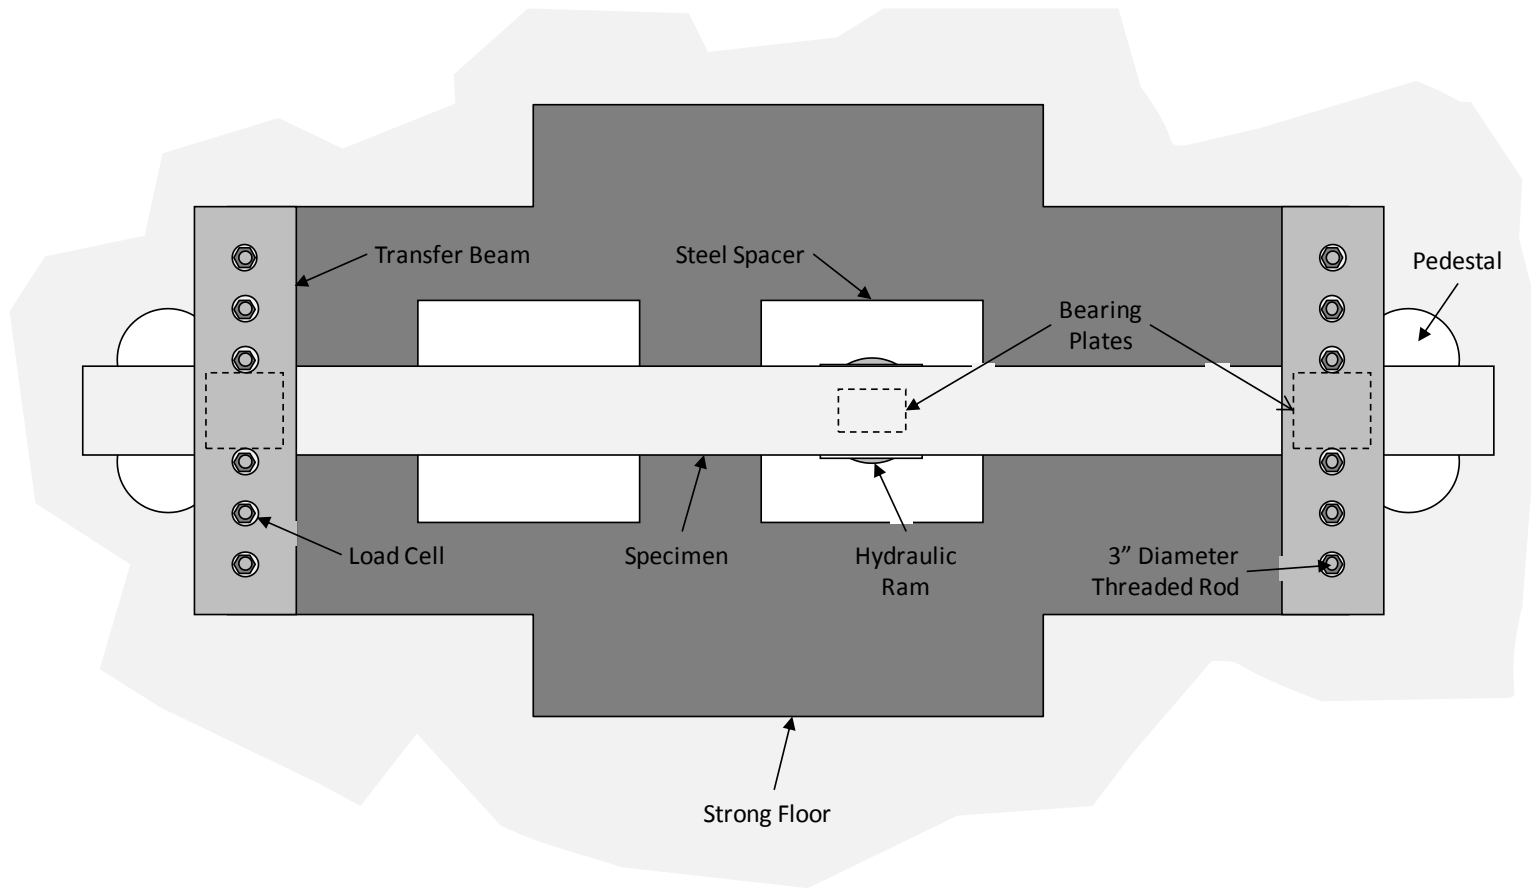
Large-Scale Beam Test Facility, Plan View
